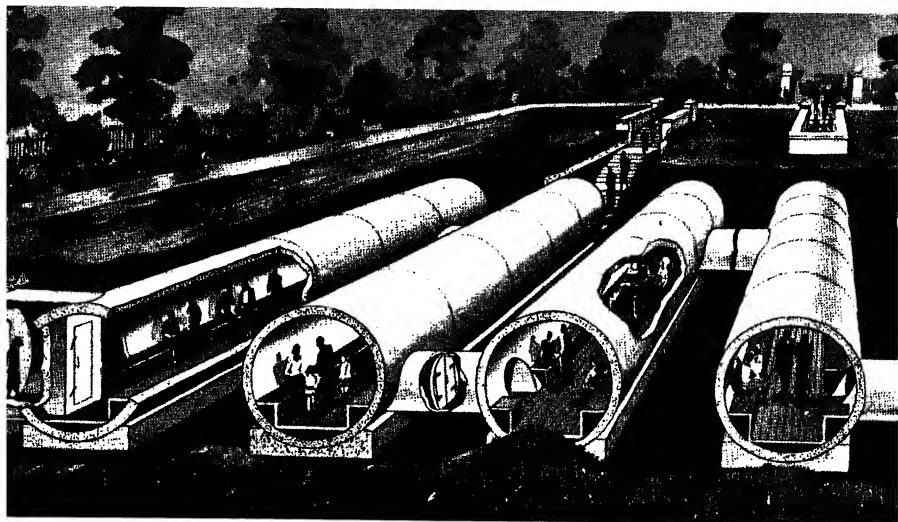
Cut-away view showing connected concrete tube shelters under open spaces.
